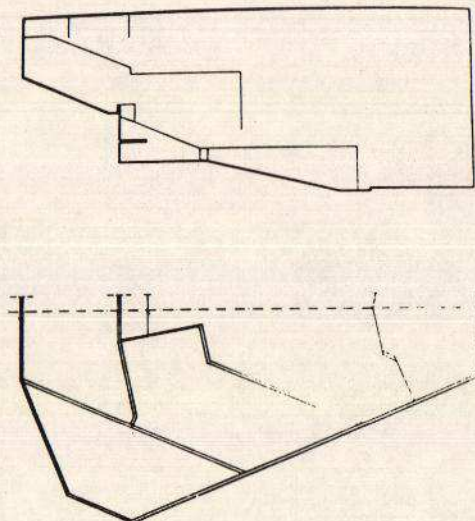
Longitudinal section (top) and half the symmetrical plan of the Las Palmas hall (Arch: Oscar Tusquets).
